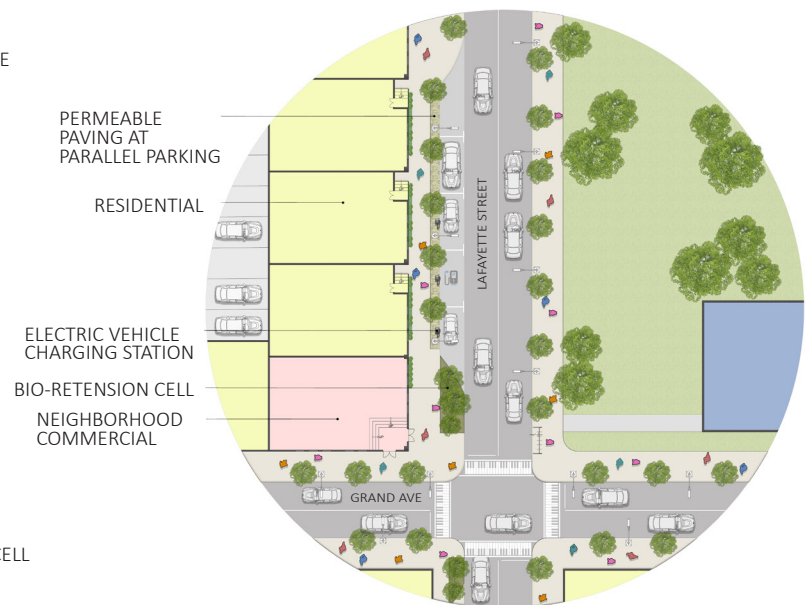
Plan of Intersection of Lafayette and Grand
